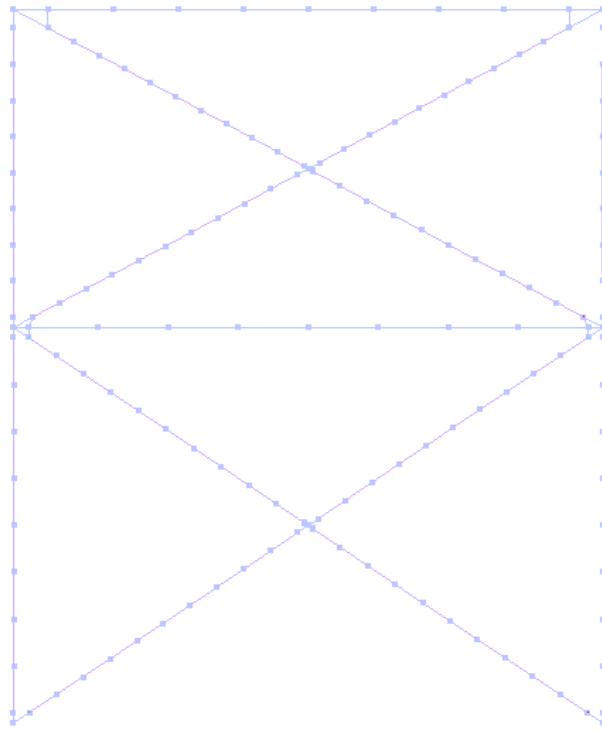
Undeformed shape of a typical 2T-CBF modeled with OpenSees (leaning column not shown)
